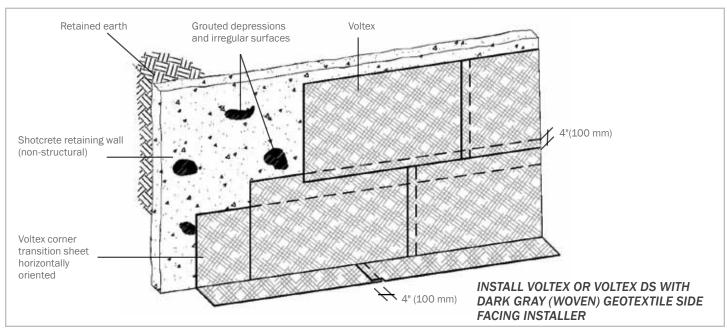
Voltex installation over an earth formed shotcrete retention wall prior to cast-in-place concrete wall.
